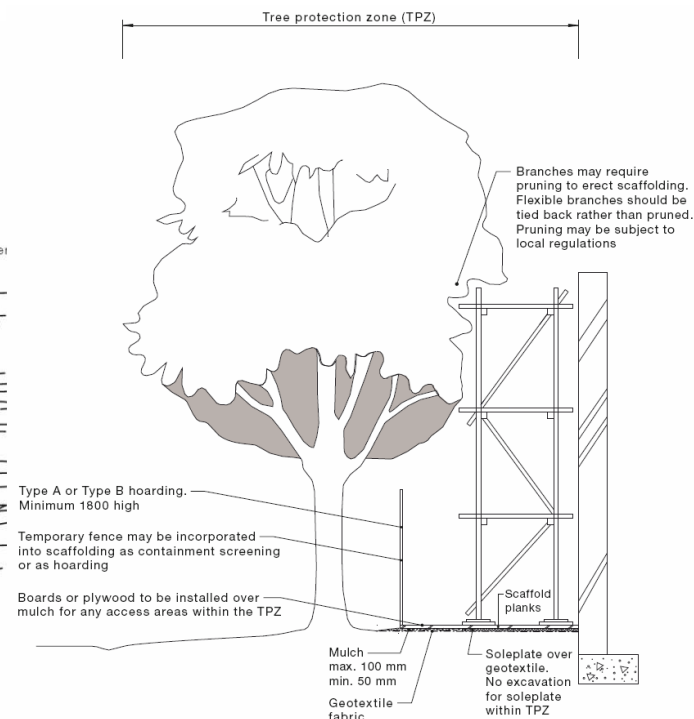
EXAMPLES OF TRUNK, BRANCH AND GROUND PROTECTION
